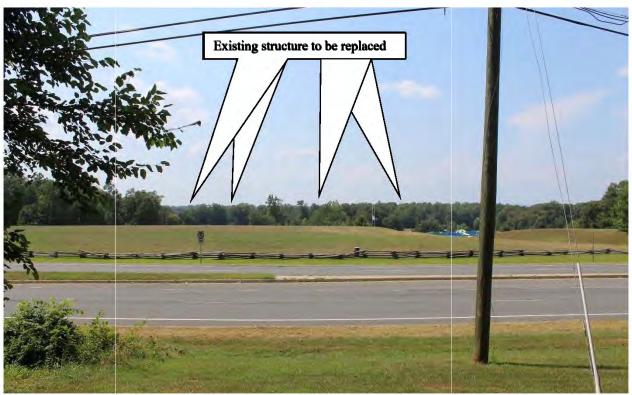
Photo location 11- View from Signal Hill (Multiple project structures visible), facing northwest.
